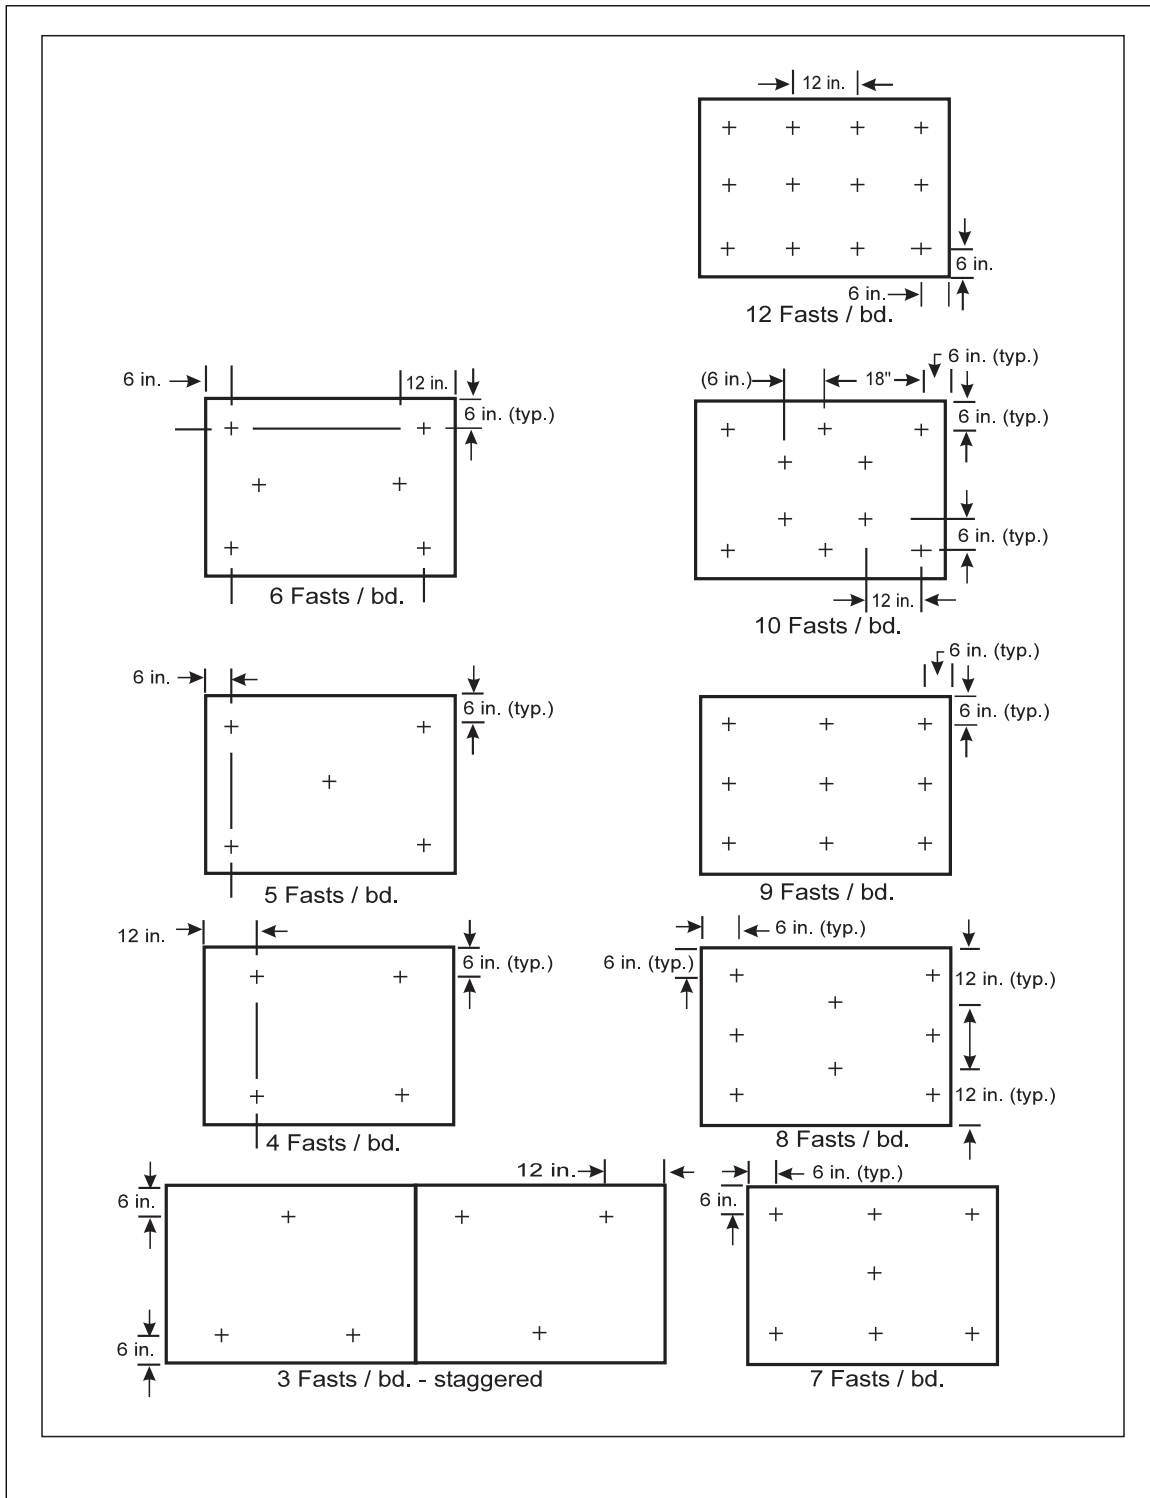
Fastener placement 3 x 4 ft (0.9 x 1.2 m) boards used on steel decks with a 6 in. (150 mm) module or rib spacing
